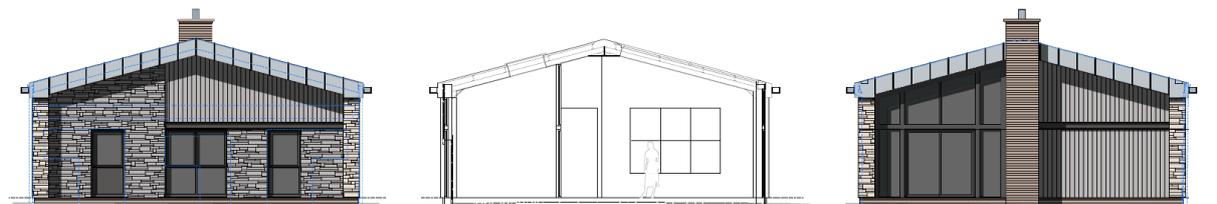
Pre-Application South Gable elevation (Left), Section and North Gable elevation (Right)
